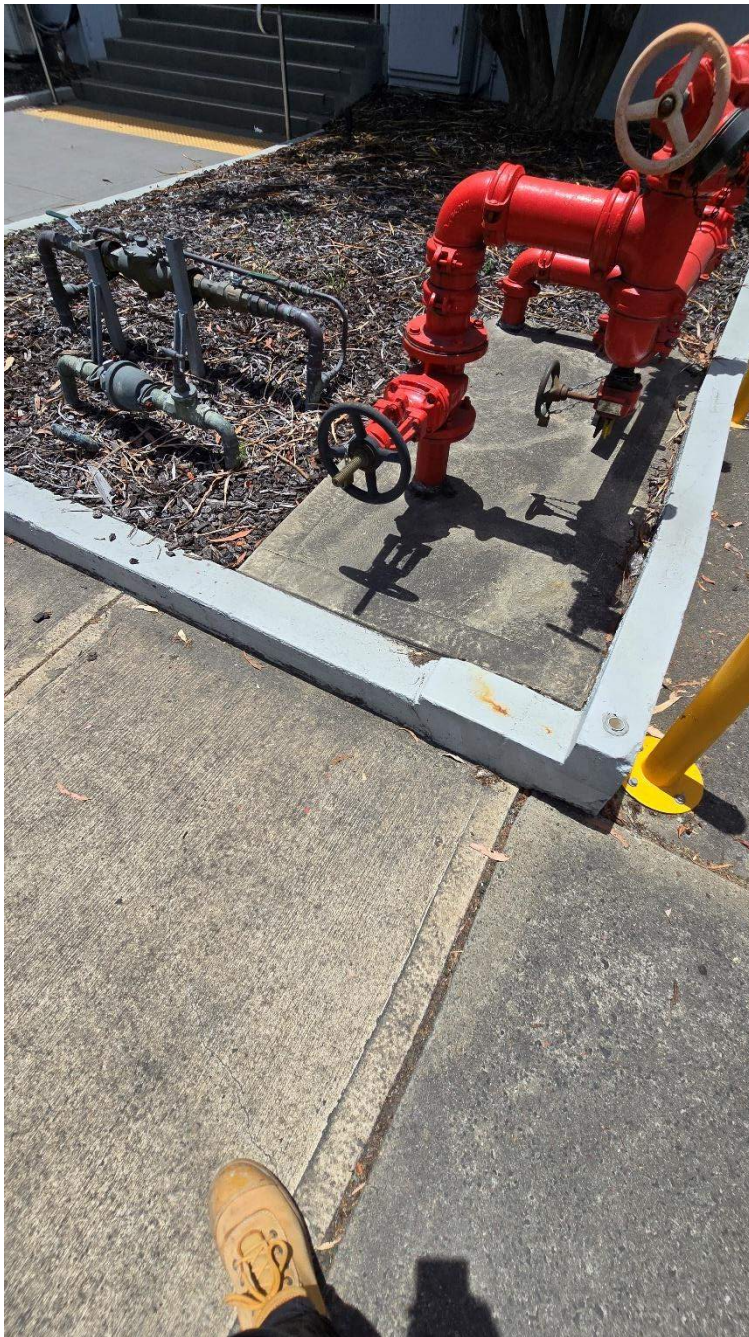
Cracks observed (16) - Misalignment of retaining wall
